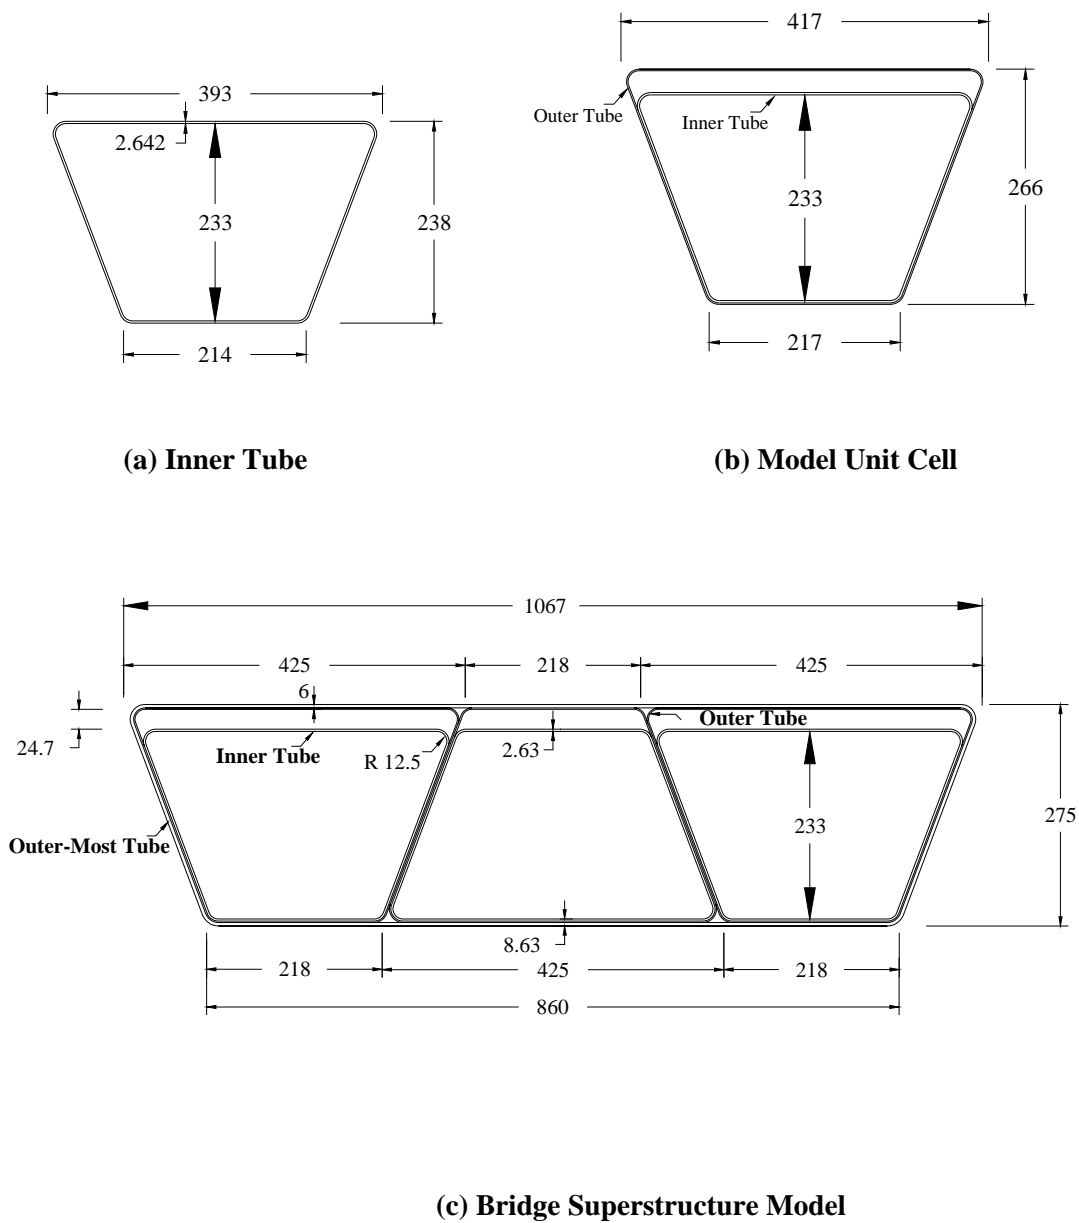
Cross-Section of the Hybrid FRP-Concrete Superstructure Model (Units in mm).
